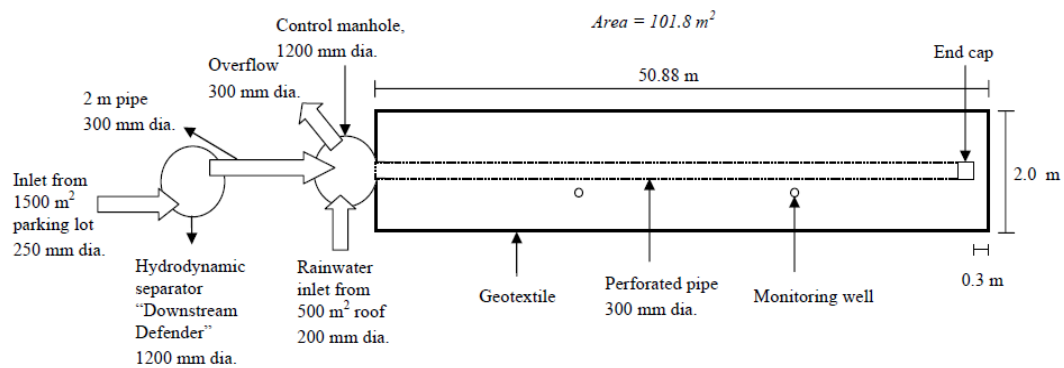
Typical plan view of the infiltration trench receiving road (1500 m<sup>2</sup>) and roof runoff (500 m<sup>2</sup>) (Seters et al., 2013).
